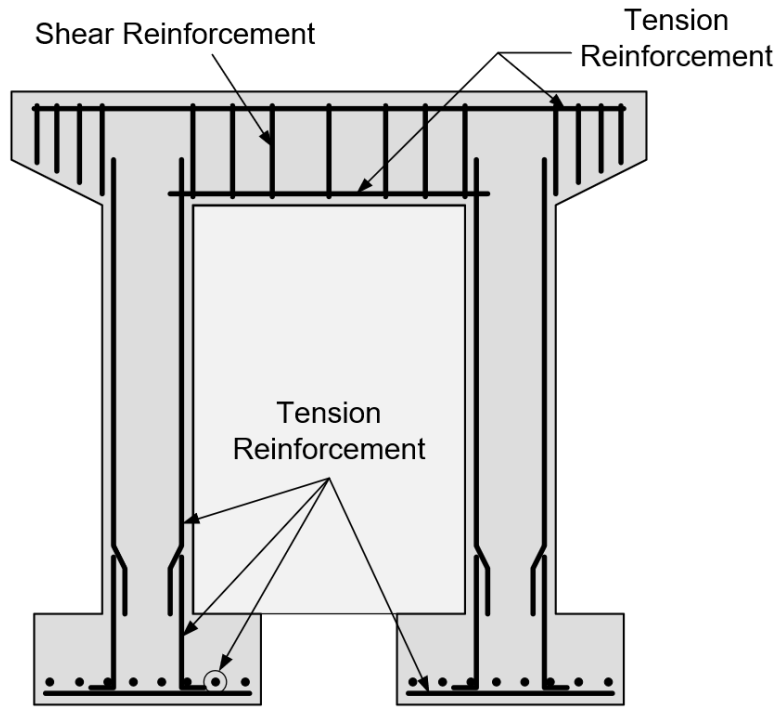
Primary Reinforcement in Column Bent with Web Wall
